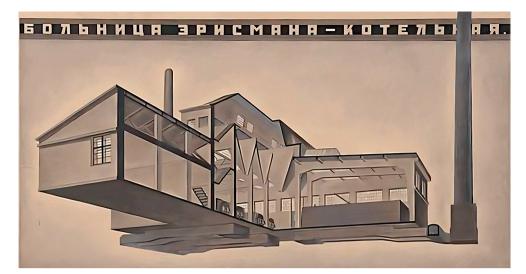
Reconstruction project of the Hospital named after F.F. Erisman. Boiler house building. Section [12]
